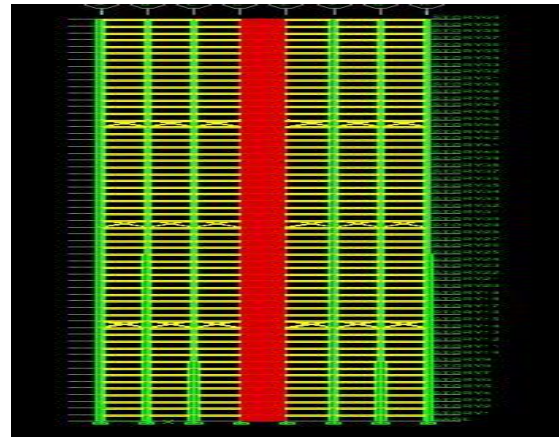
Elevation of multi OB-H-V on 15-30-45 stories at section 4-4
